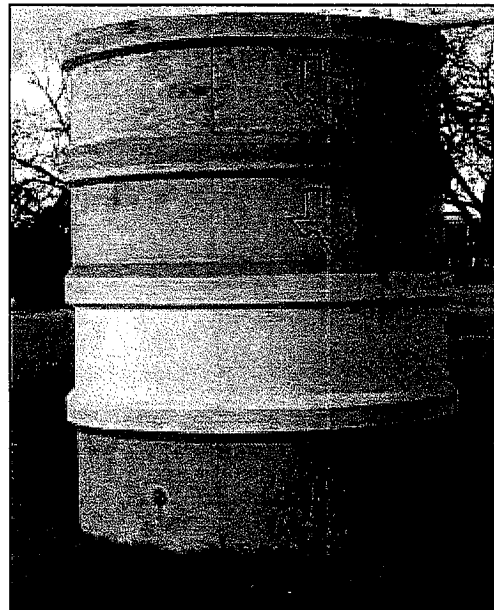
Concrete tank fabricated from stacking rings of concrete
